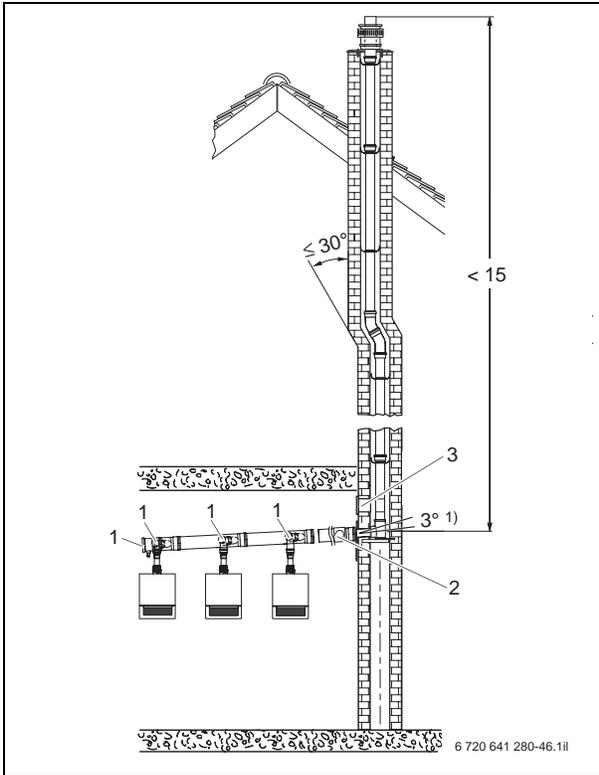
Example with the inspection aperture located in a cascade (dim. in m)
